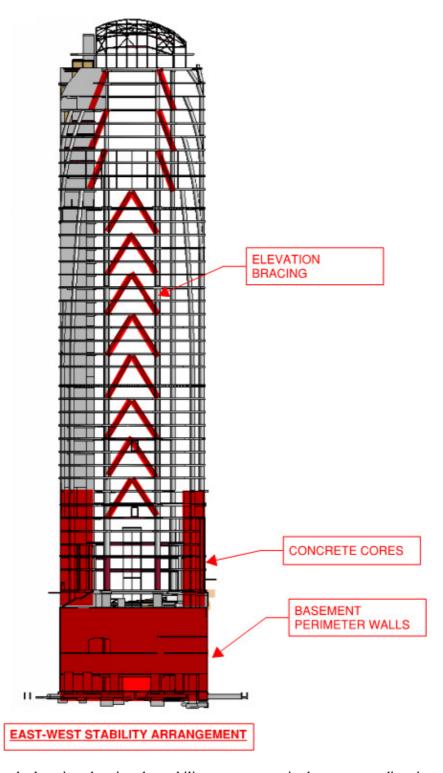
North elevation showing the stability arrangement in the east-west direction.
